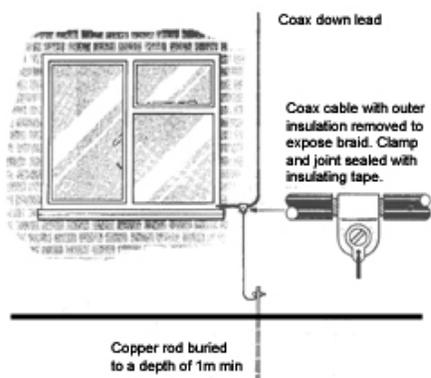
Earthing coax braid at entry to building to minimise strike damage.
